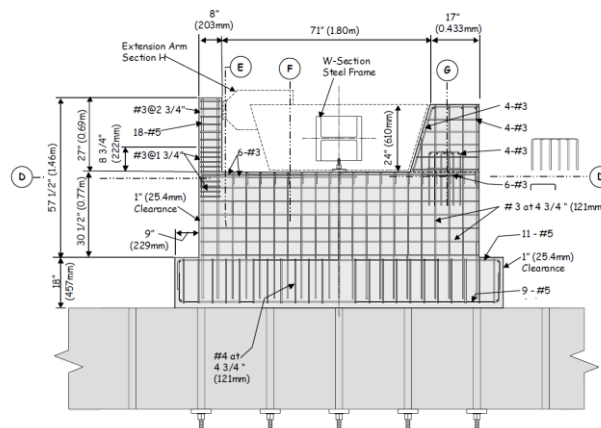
Elevation view of design details for Specimen 2 (from Megally et al., 2002)
